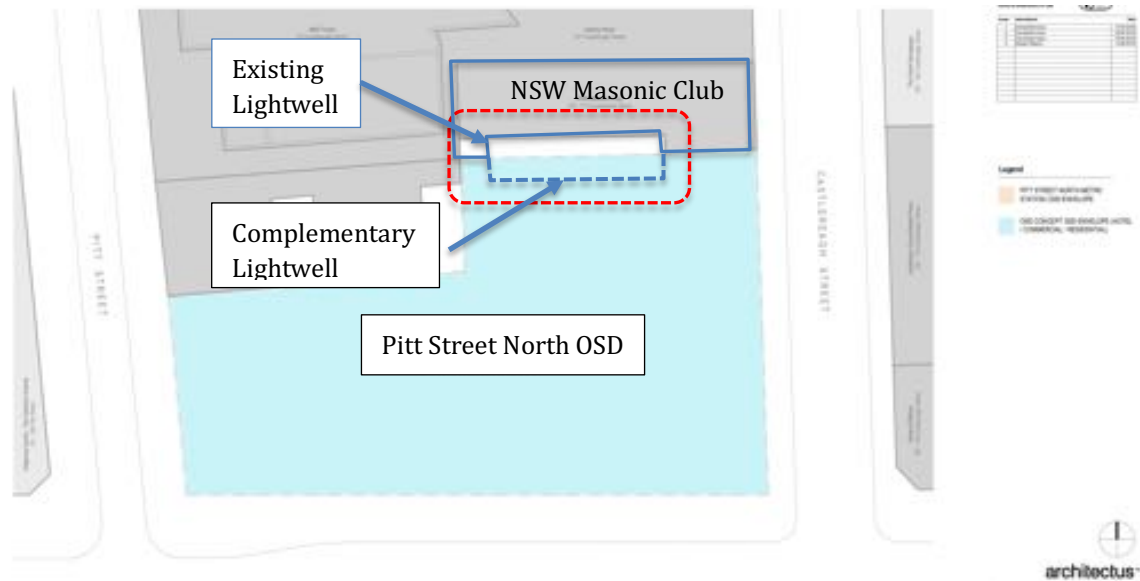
Planning Envelope Drawing - Podium Levels- Pitt St. North OSD. NSW Masonic Club outlined in blue. Pitt Street North OSD Concept Application. Appendix F-Built Form and Urban Design Report. Architectus 2018.
